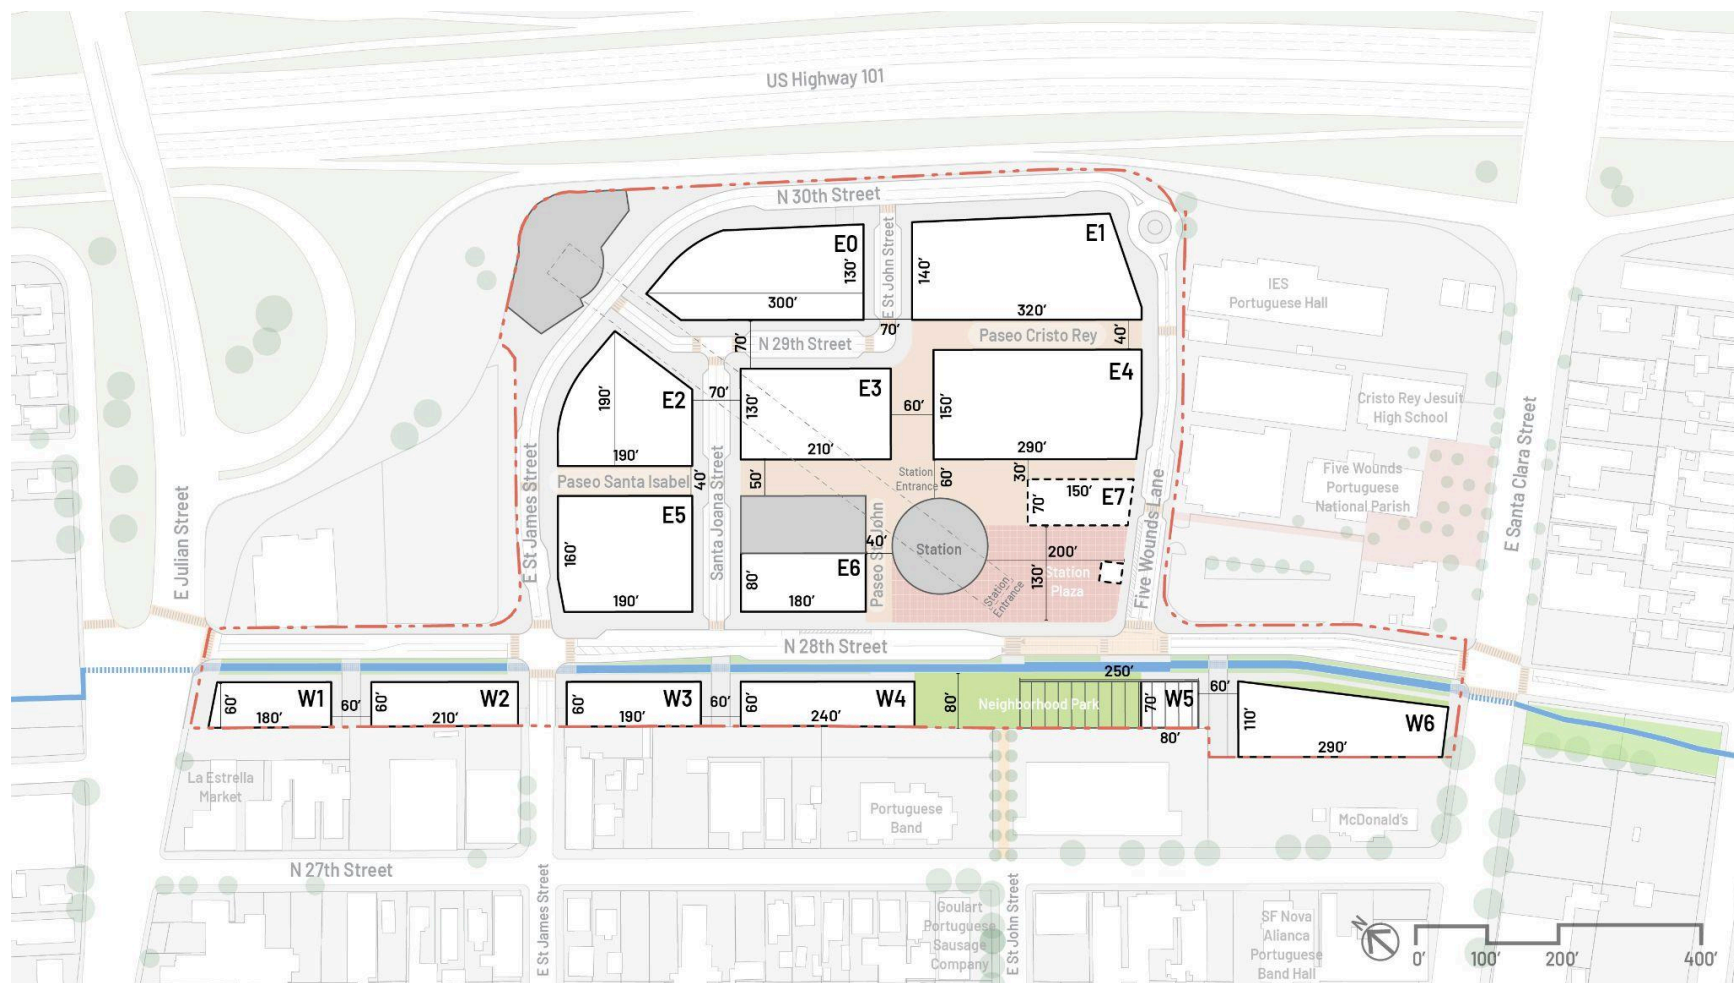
Conceptual dimensioned Transit-Oriented Development site plan
